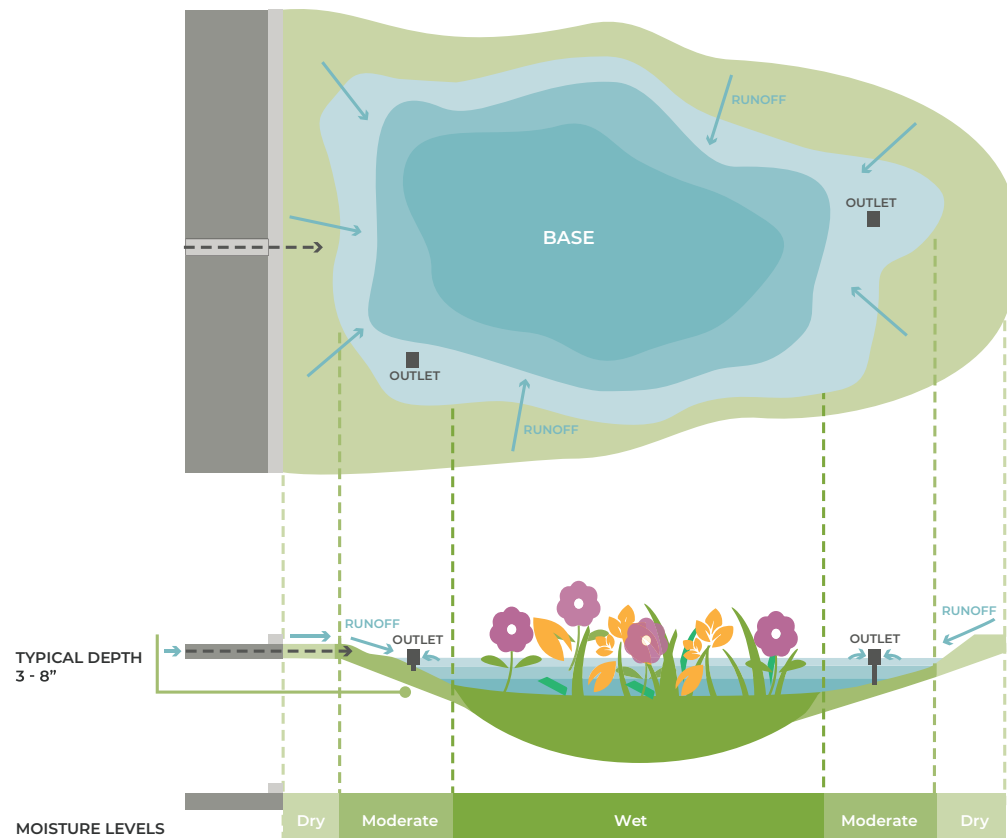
// RAIN GARDEN EXAMPLE
